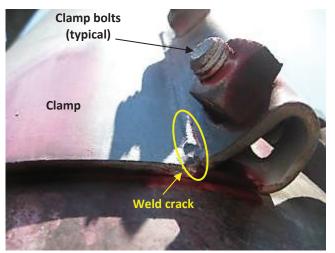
Weld crack (verified with dye penetrant)in hanger to chord connection clamp (two chord truss)
